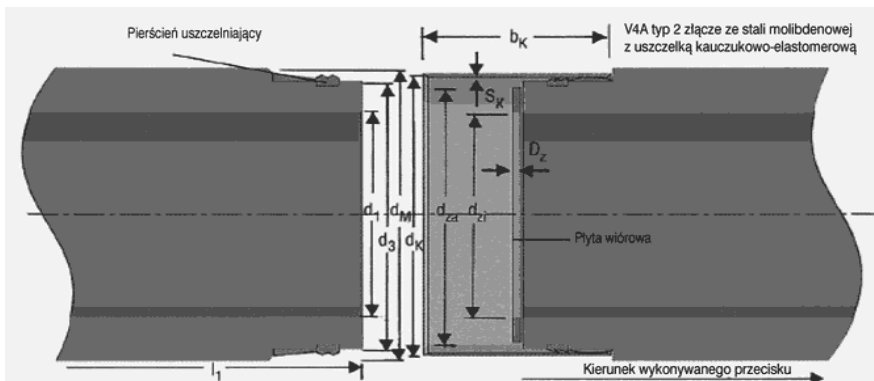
The connection of stoneware jacking pipes (DN 150), [34]
